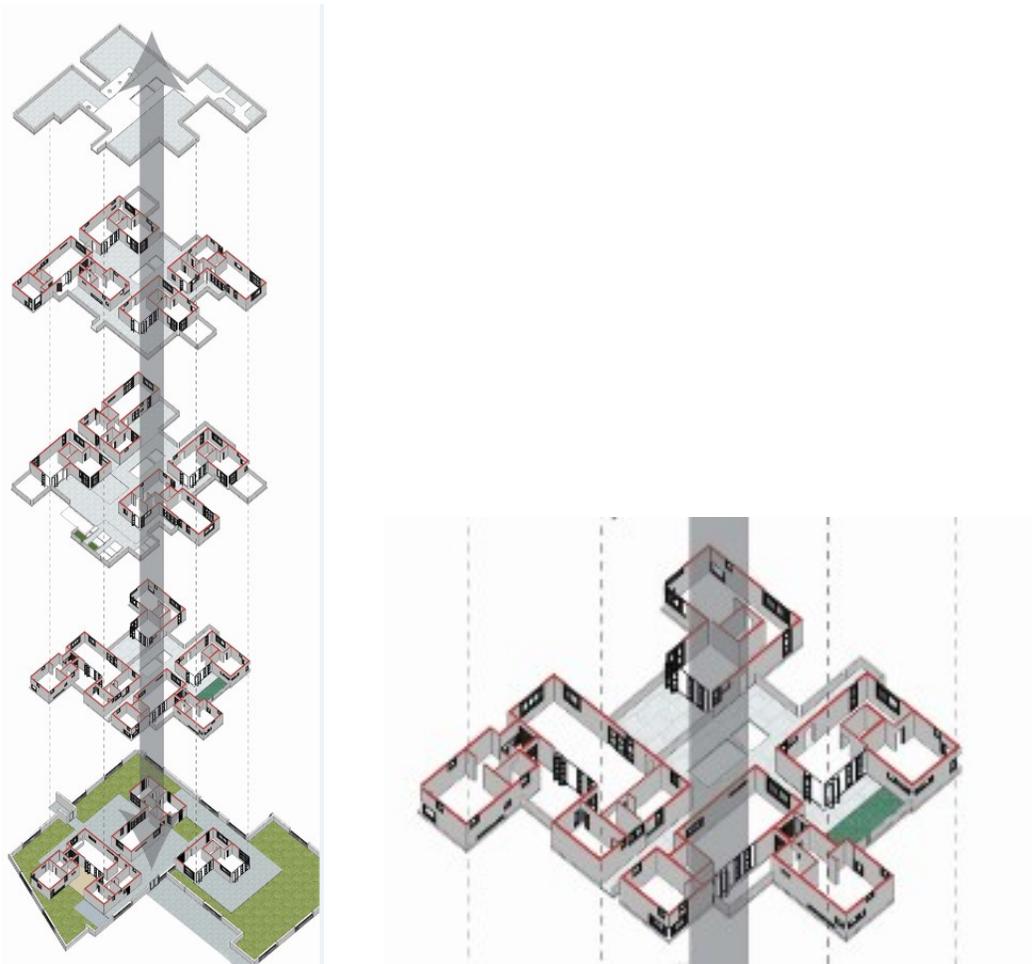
Indoor & Outdoor Space Diagram *Source: Author
